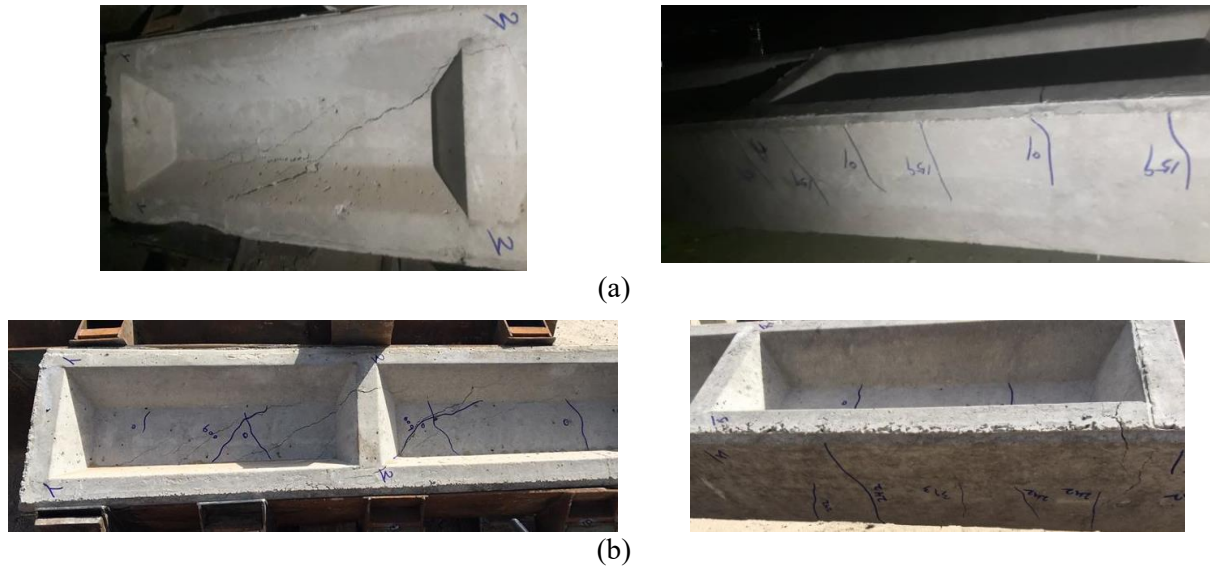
Cracking in: a) 9-400-30-1, and b) 9-400-30-2.
